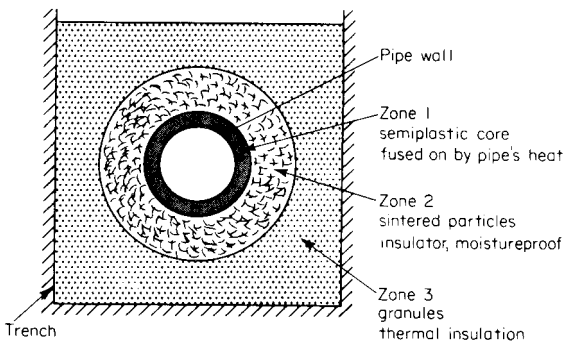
Granular-fused conduit for underground steam pipe.
